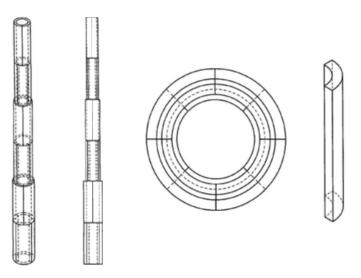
Cylindrical shaped tower with varying segment diameter, taken from De Roest (2006)
